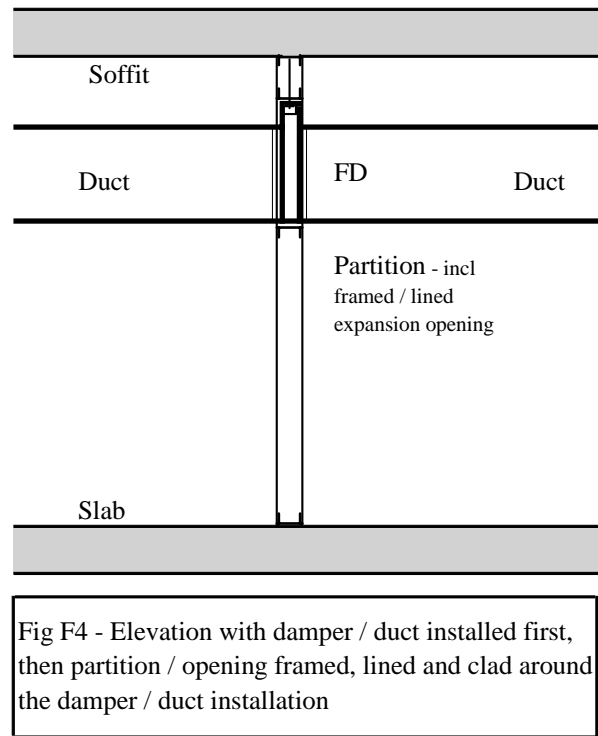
Elevation with damper / duct installed first, then partition / opening framed, lined and clad around the damper / duct installation
